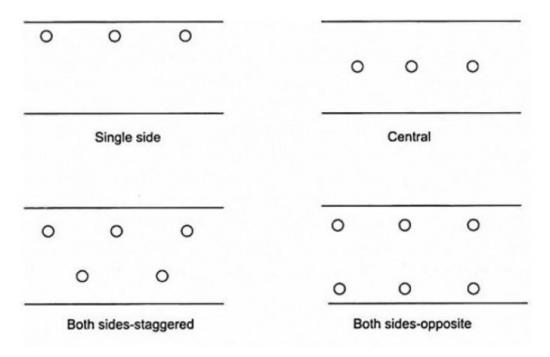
Pole Arrangement Schemes in Street Lighting Design
